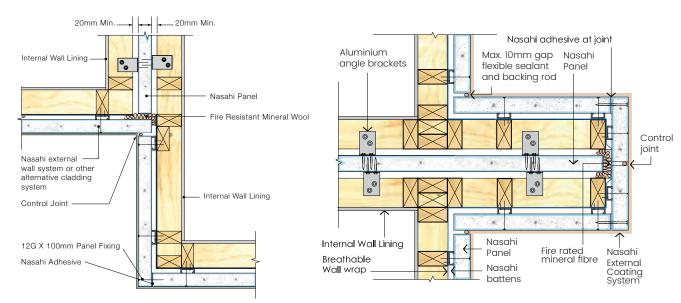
PARTY WALL 4-WAY INSTERSECTION
